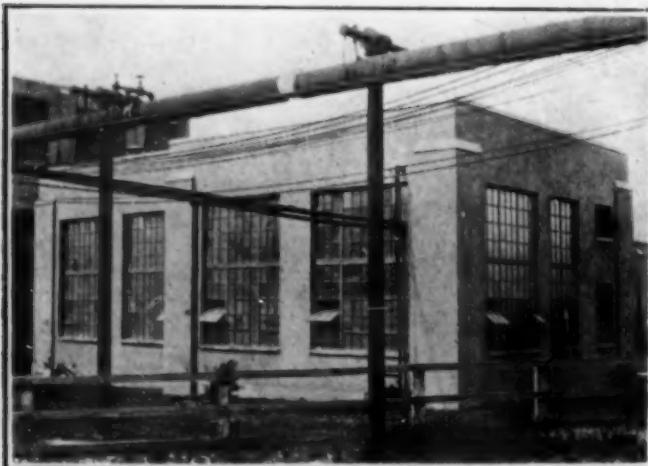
Typical of the New Type of Construction for Buildings at the Parlin Plant
